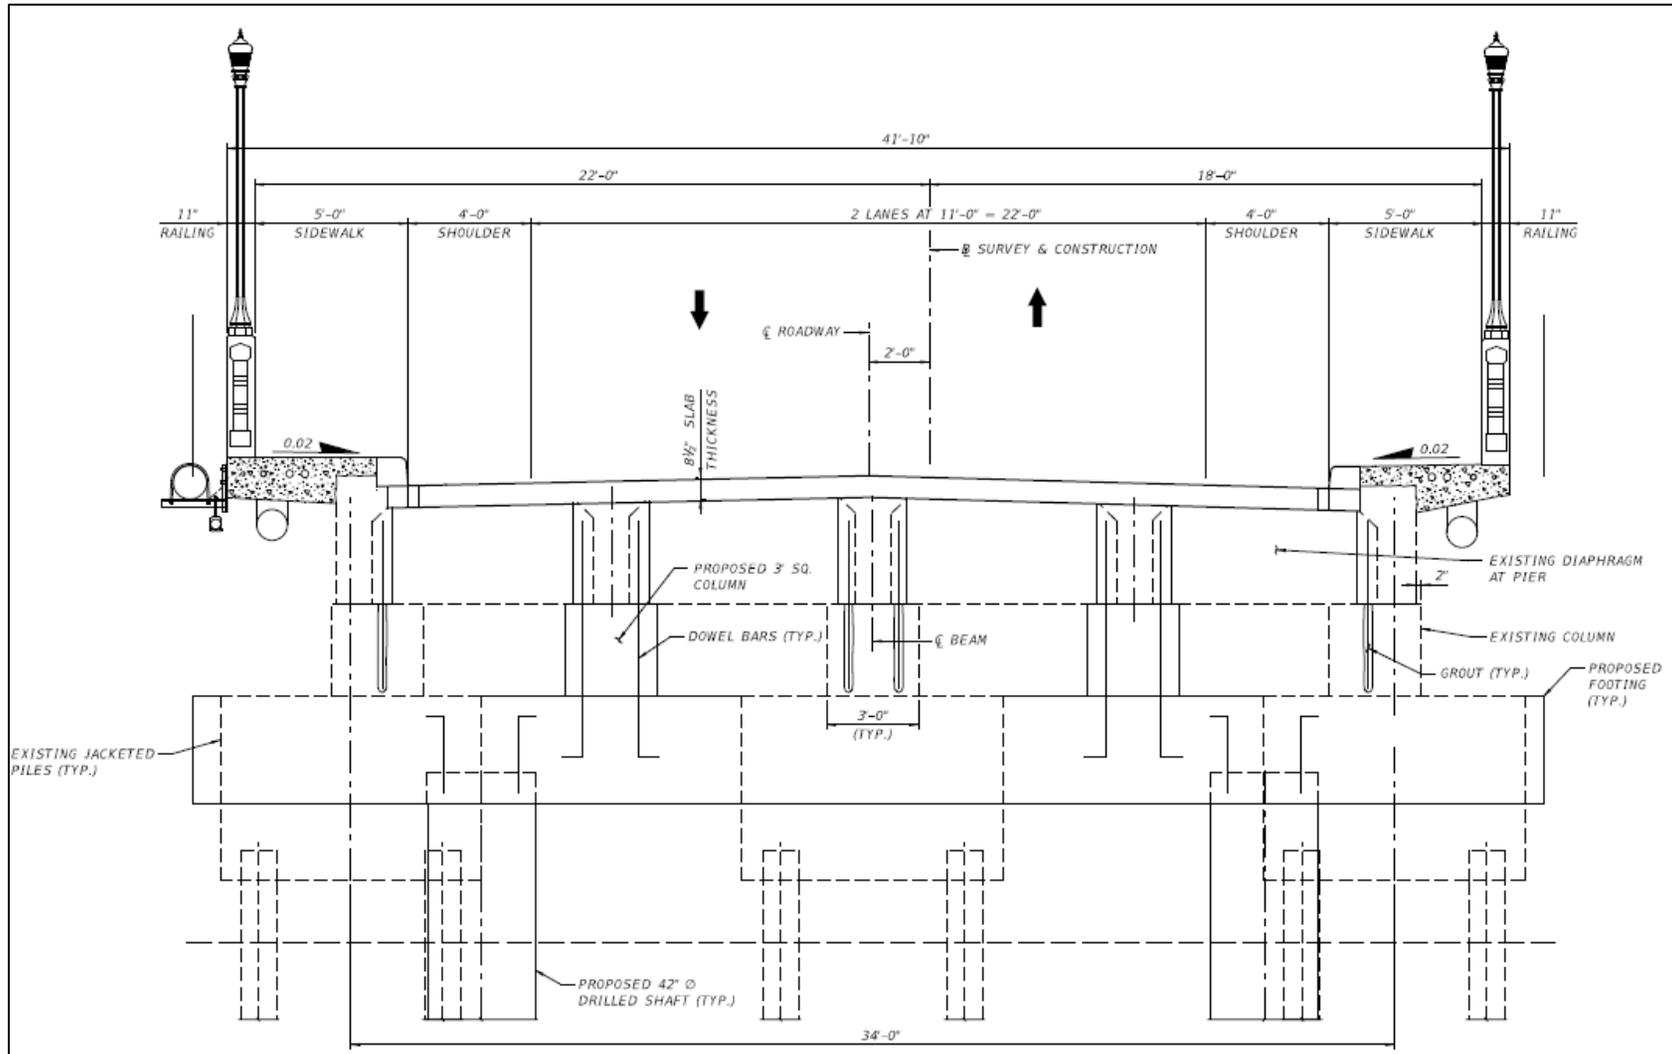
Rehabilitation Alternative 4: Beam and Foundation Strengthening Concept
